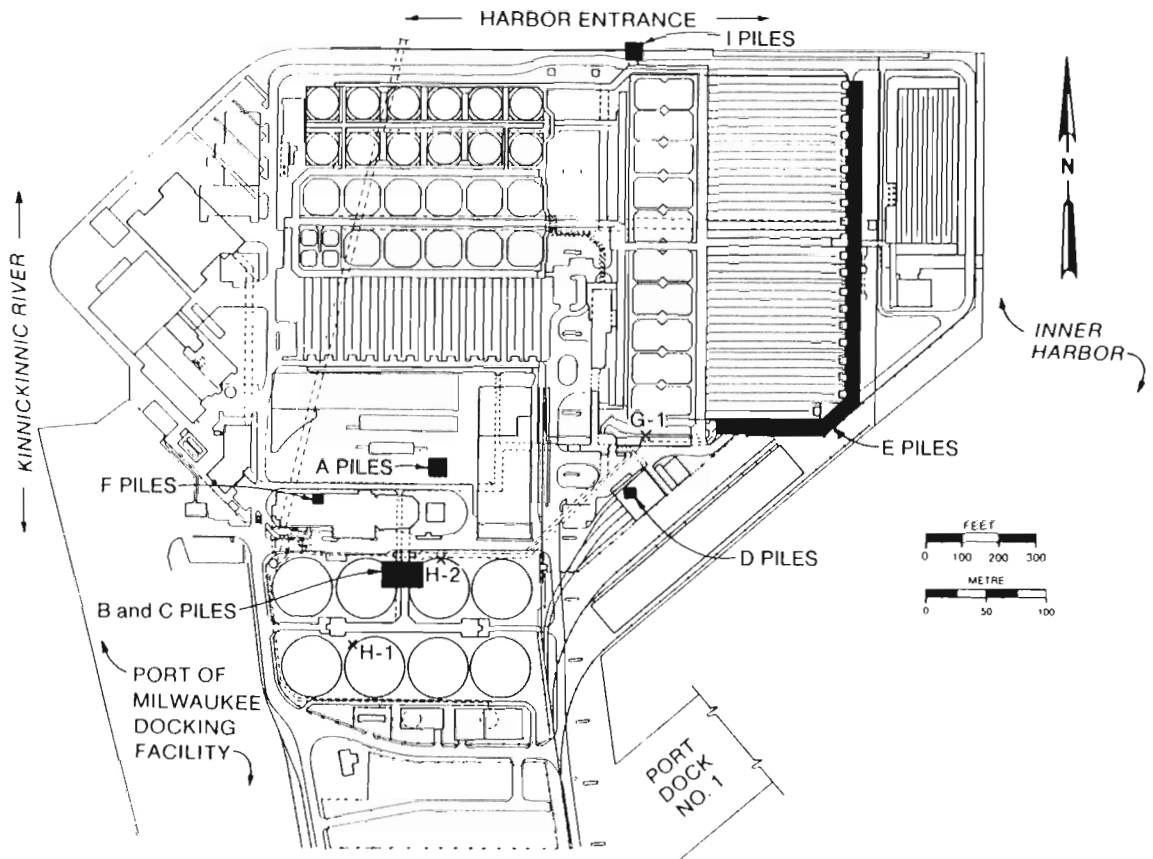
Plan View of Jonew Island Treatment Plant Showing Test Pile Locations
